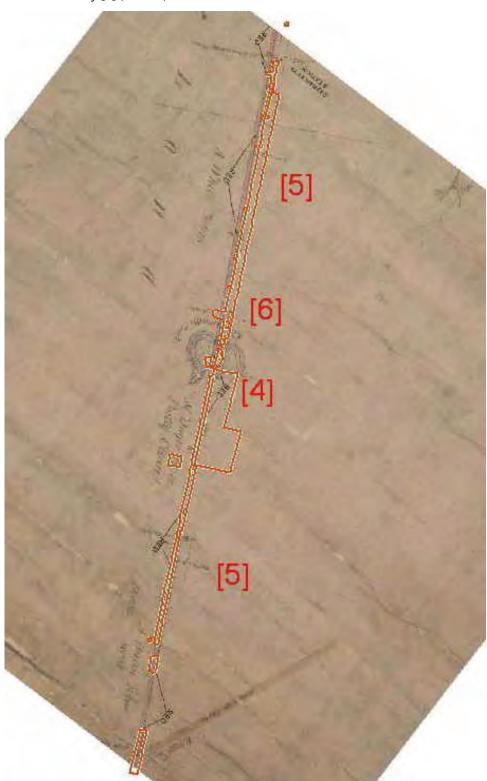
Extract from an 1867 Crown plan of the road adjacent to the railway line, showing gates [5], drain [6] and the timber beam bridge [4] (Source: NSW Land Registry Services, Crown plan R674.1603)
